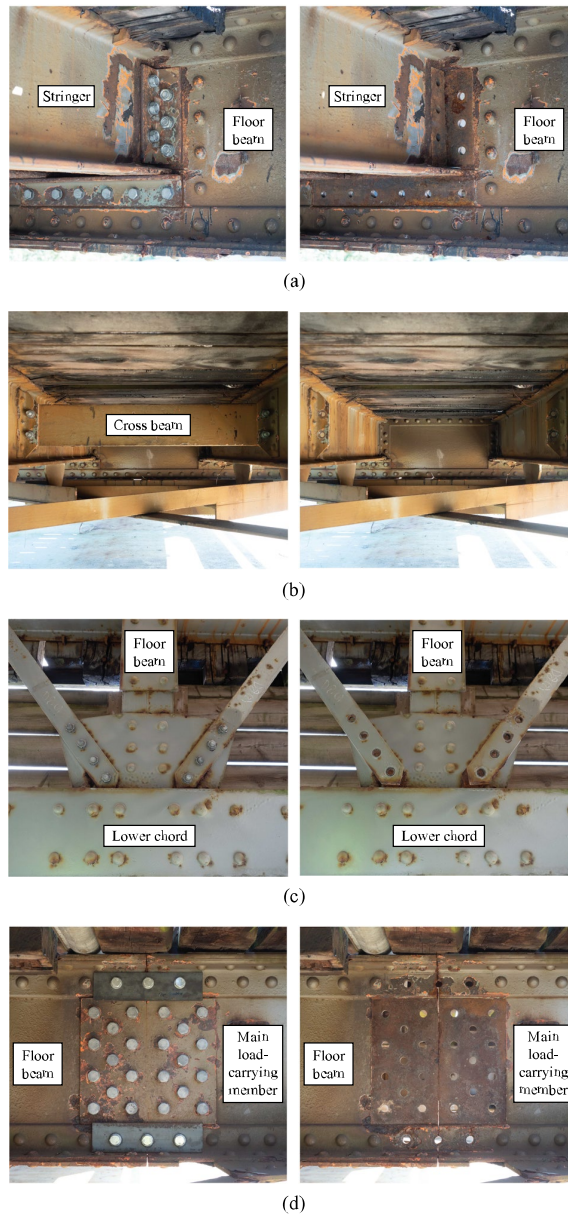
The damage types imposed on the bridge (before and after damage). (a) Stringer-to-floor beam connection. (b) Stringer cross beam. (c) Lateral bracing connection. (d) Connection between the floor beam and main load-carrying member.
